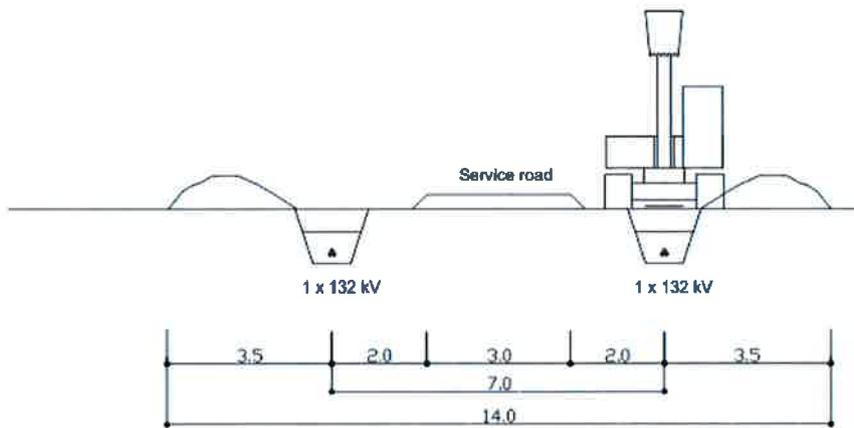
Maximum disturbance area for double set of 132 kV cables with service road between the two trenches. Excavated soil is placed beside the trench.
